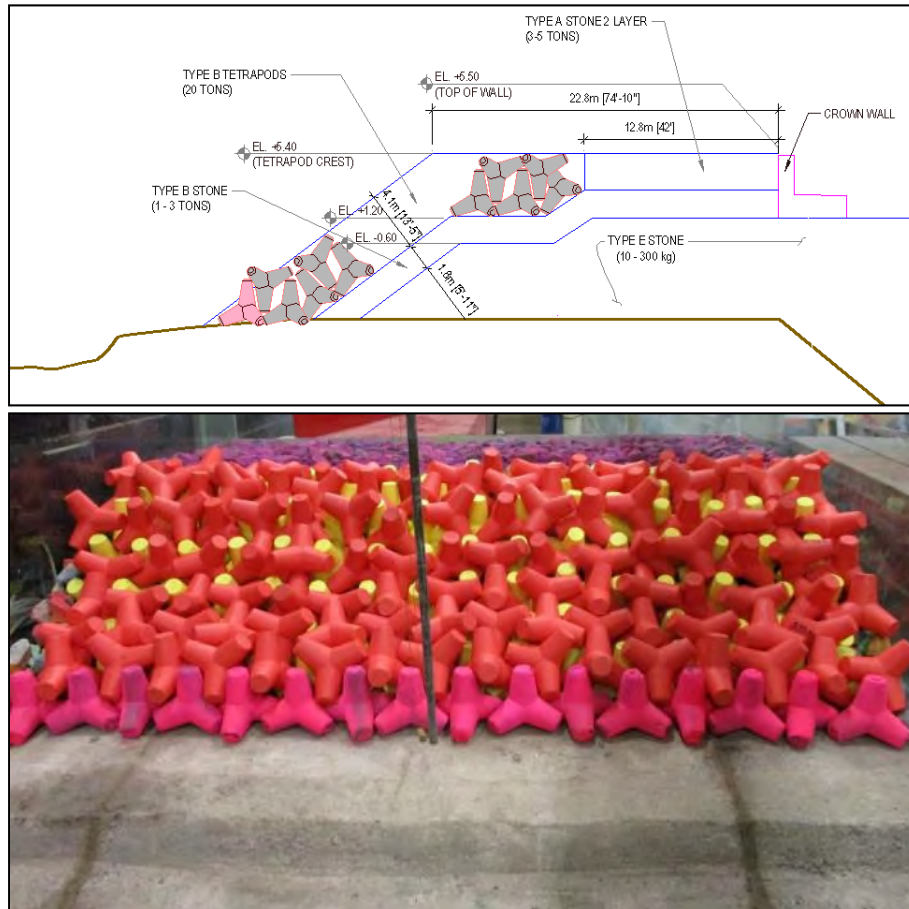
Top – shallow water cross-section design; bottom - constructed shallow-water cross-section.
